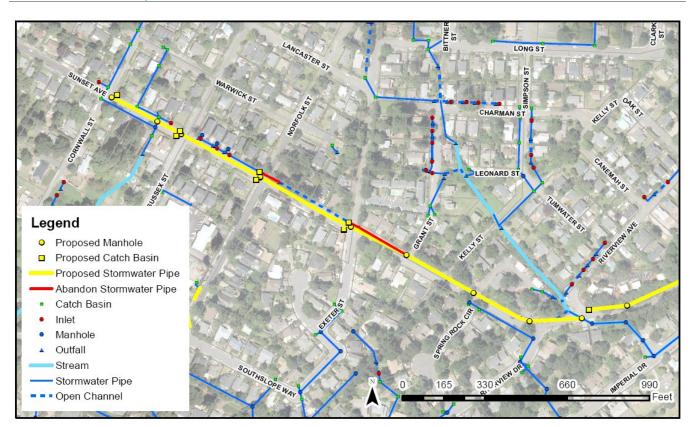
Project I-6. Sunset Avenue Improvements-West (Proposed configuration)
